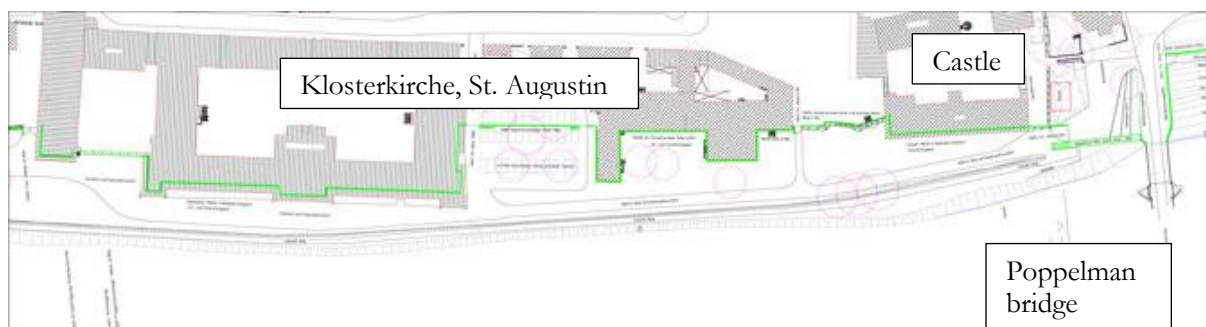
Project 3 layout (source: hochwasserschutz-grimma.de)
